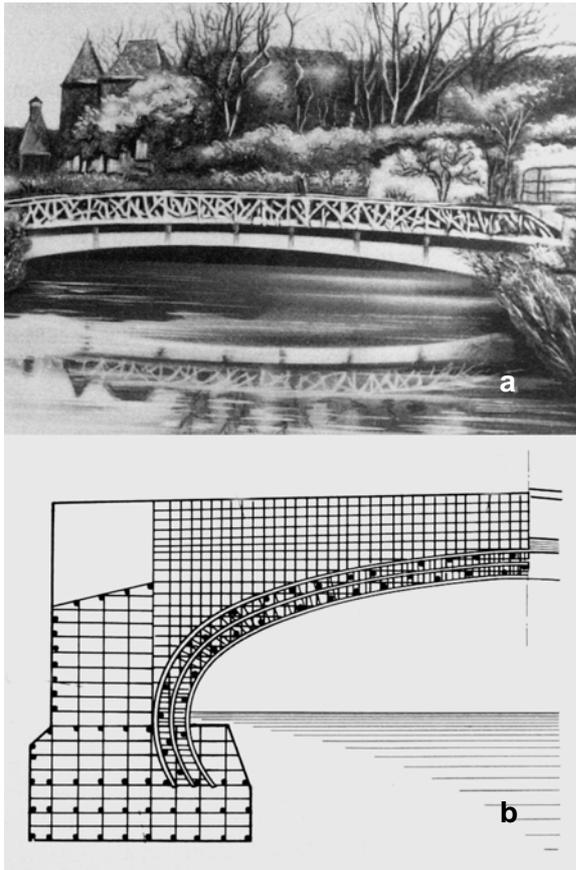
Reinforced concrete bridge design, Monier. (a) First reinforced concrete bridge in the world, Monier, 1875. (b) Patent design, 1873. (Wittfoht)
